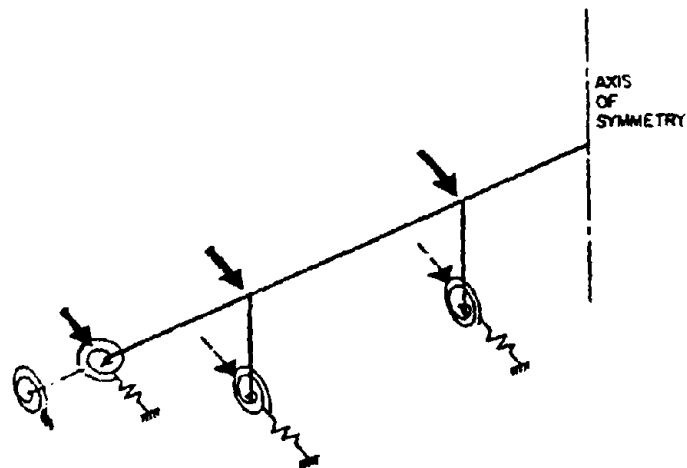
Schematic View of One-Half Bridge System (after Ref. 18).
